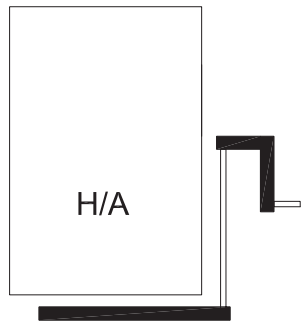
DETAIL OF BRICK WALL AND METAL GATE ALONG 154 AVE
